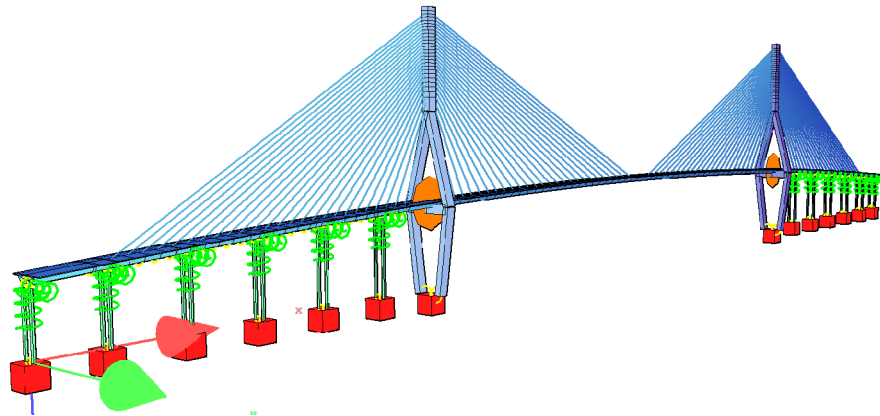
Structural Model of the integral bridge structure using SOFiSTiK.
